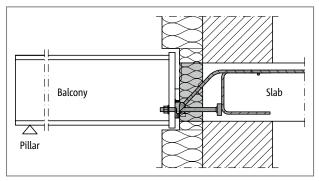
Schöck Isokorb® T type SQ: Connection to reinforced concrete inner slab; insulating element within the core insulation zone.
